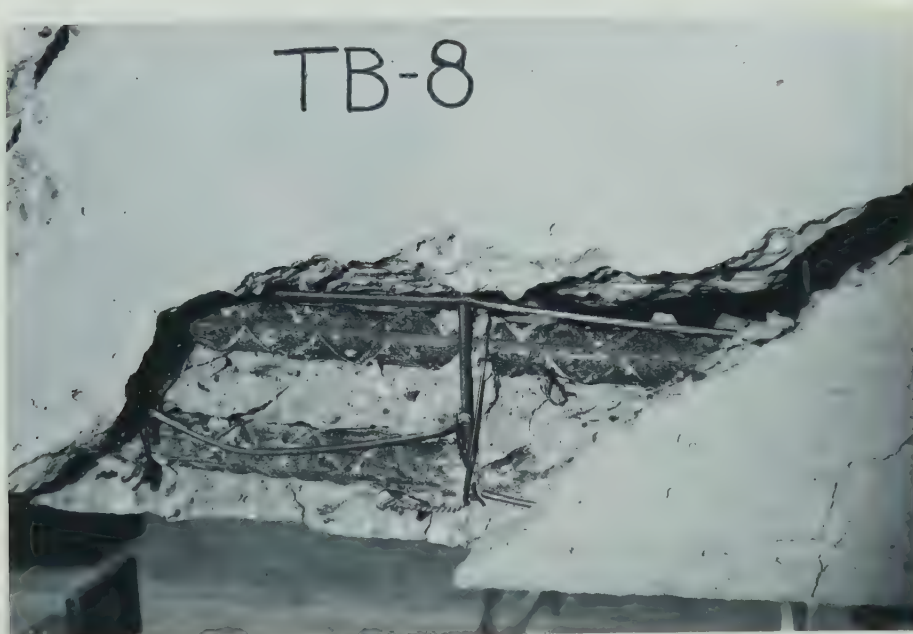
Damage to anchorage at bottom of failure crack in TB 8
